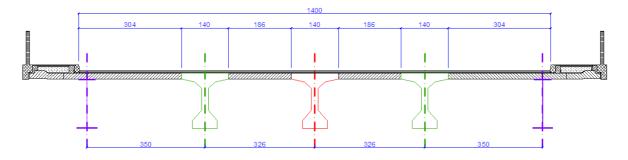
Cross section of the deck with two extra steel beams (annotations in cm)
